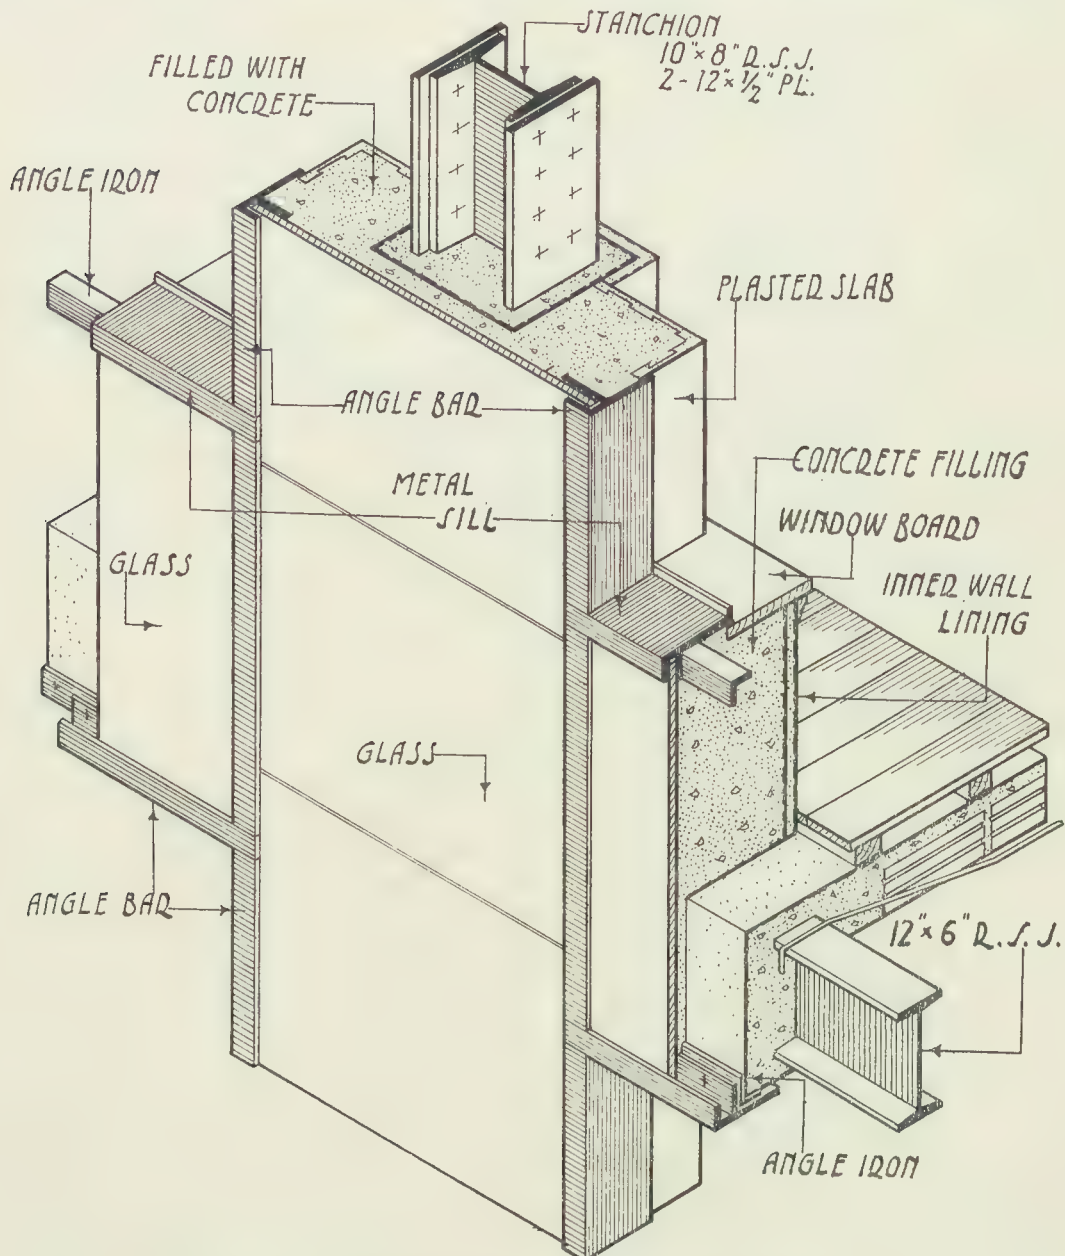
CONSTRUCTION OF GLASS-FACED CONCRETE WALL
